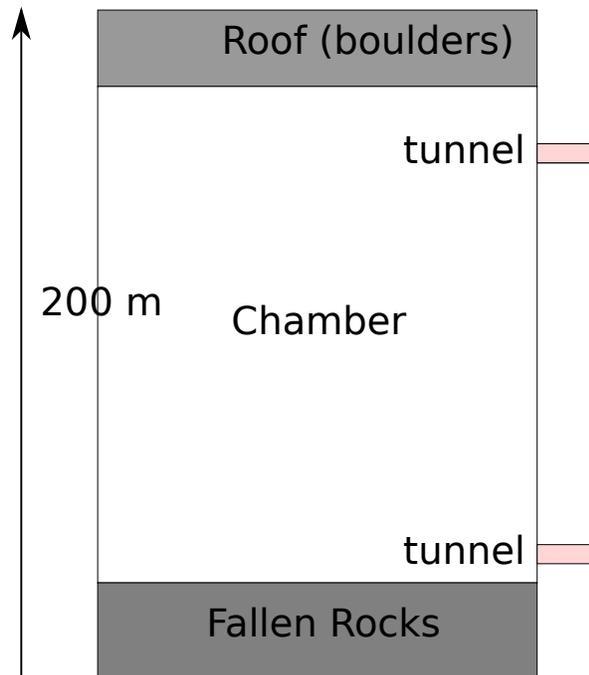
Roof collapse in a cavern. The cavern lies under an open pit with the roof of the cavern consisting of compacted boulders (30 m deep). The floor is covered with fallen rocks (20 m deep). One tunnel is at floor level the other close to the roof.
